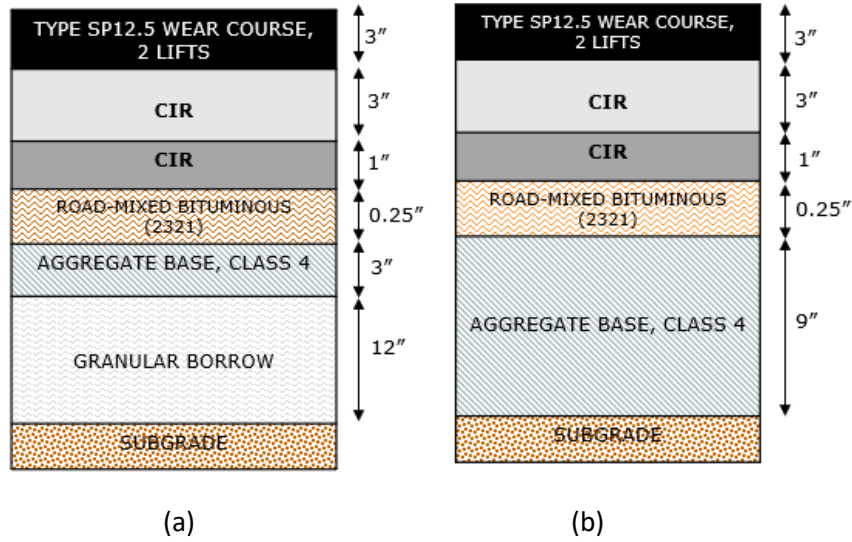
CSAH 20 pavement cross section prior to construction (a) Section A-B on Figure B 12 (d) Section B-C on Figure B 12
